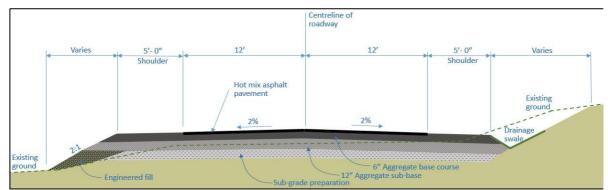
Typical road cross-section. Based on the design standard developed for Kosrae circumferential road extension project (Barret Consulting Group Inc., 1987). Source: Project Proposal Document.
